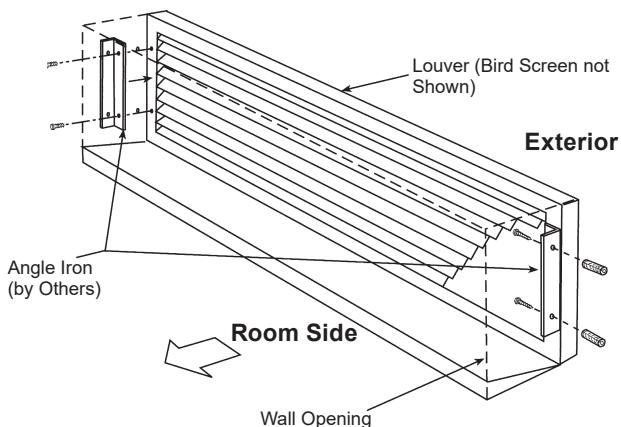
Vertical or Horizontal Blade Wall Intake Louver (Flanged) (Vertical Blade Shown)
